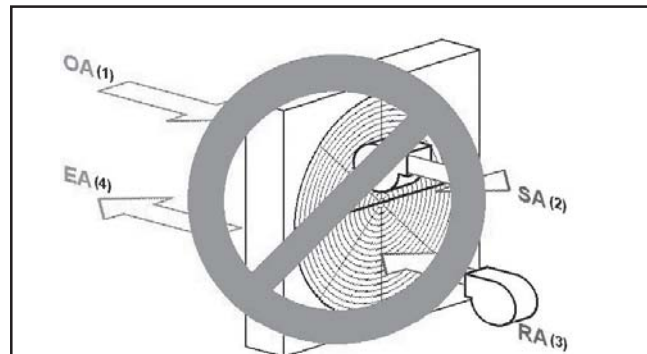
DRAW-THRU SUPPLY/DRAW-THRU EXHAUST
